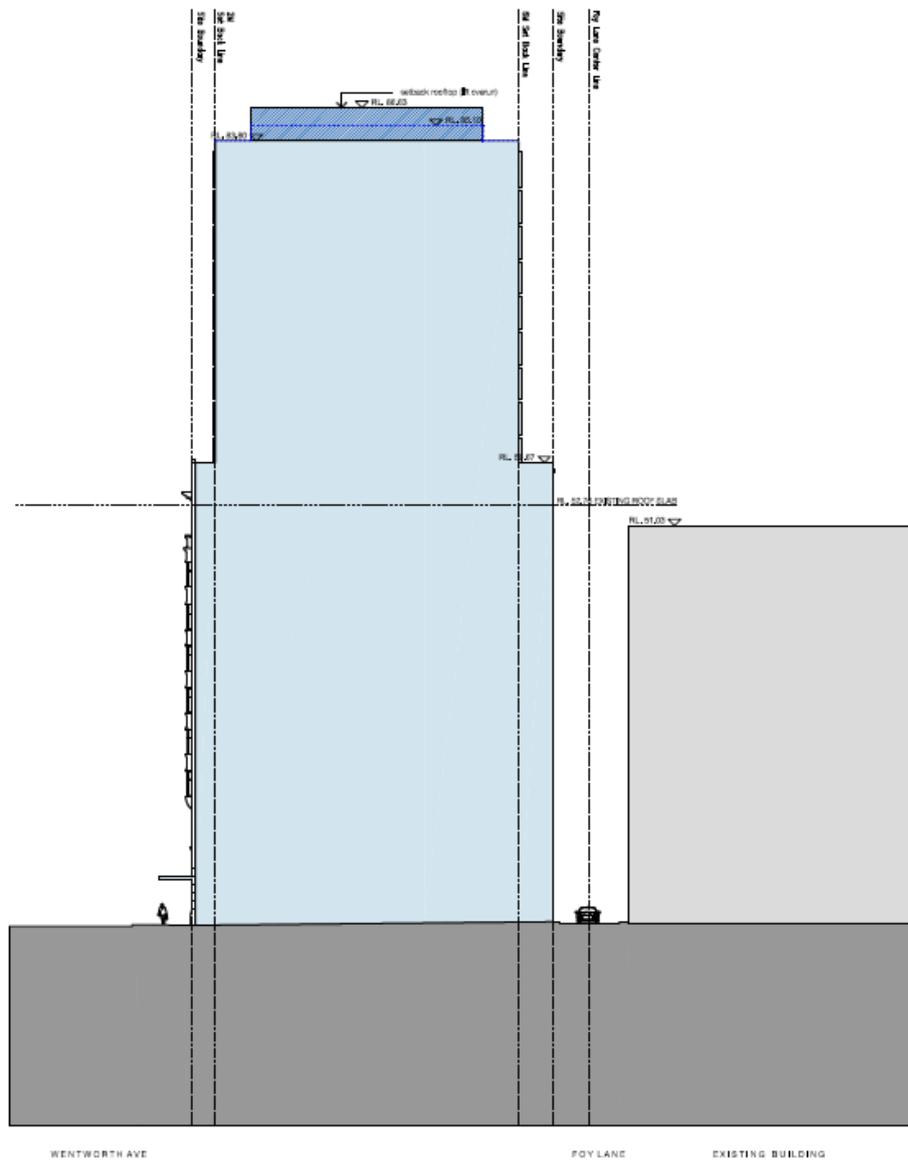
Proposed Foy Lane elevation of building envelope D/2015/920/B
